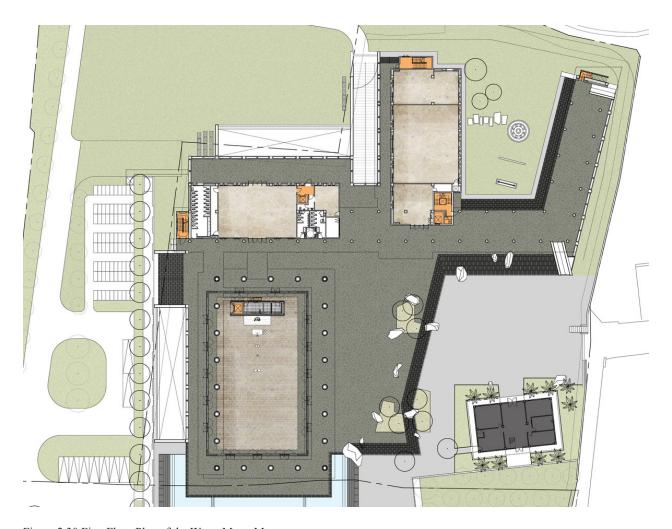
First Floor Plan of the Water-Moon Monastery
